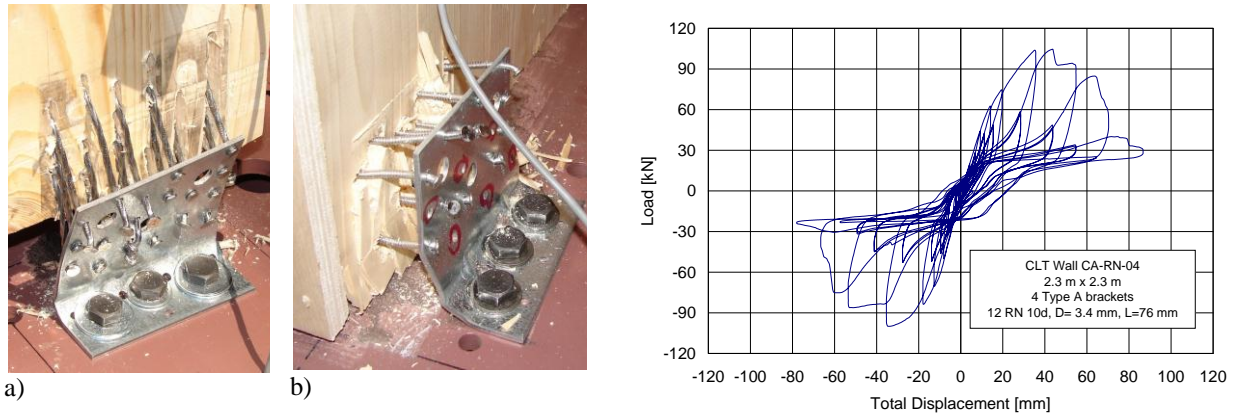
Failure mode of the brackets for: a) wall 02 with spiral nails, and b) wall 04 with ring nails; c) Hysteresis loop for wall 04 with 12 ring nails
